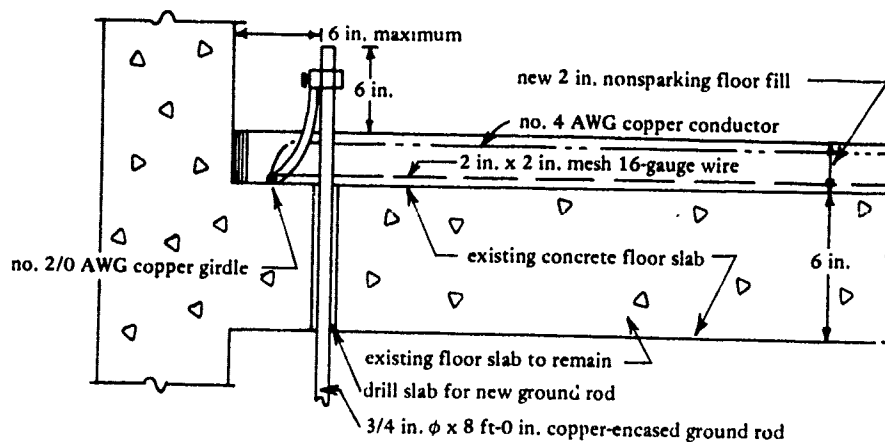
Conductive metallic topping floor and grounding installation diagram showing use of an internal girdle at NAD, Hawthorne.
